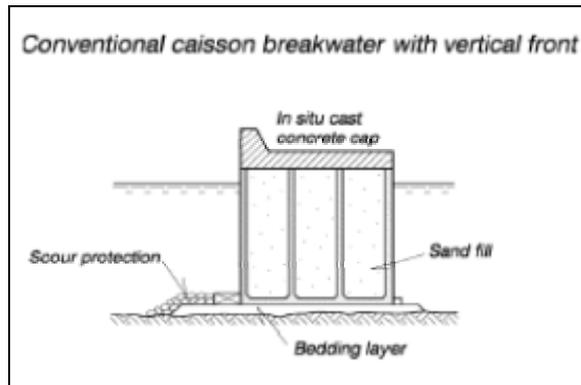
Cross-section of Conventional Caisson Breakwater (CEM, 2003)
